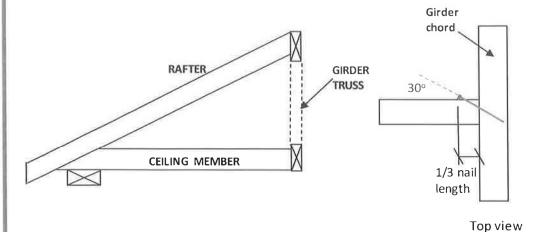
Toe-Nailing Rafter / Ceiling Member to Girder Truss
